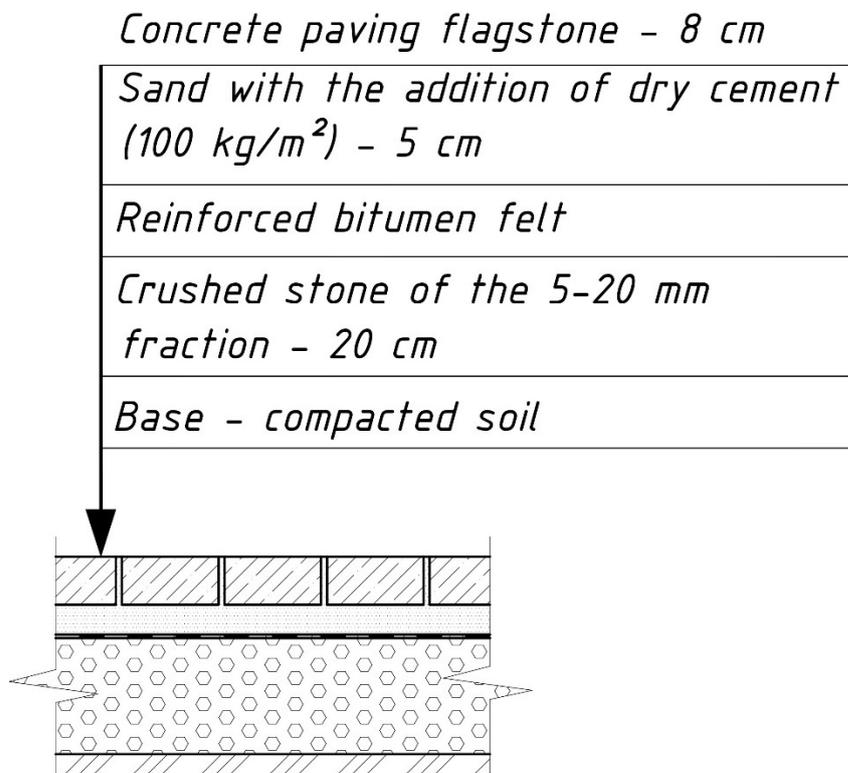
Design of a warning tactile strip in front of the entrance to the building of a multifunctional complex
